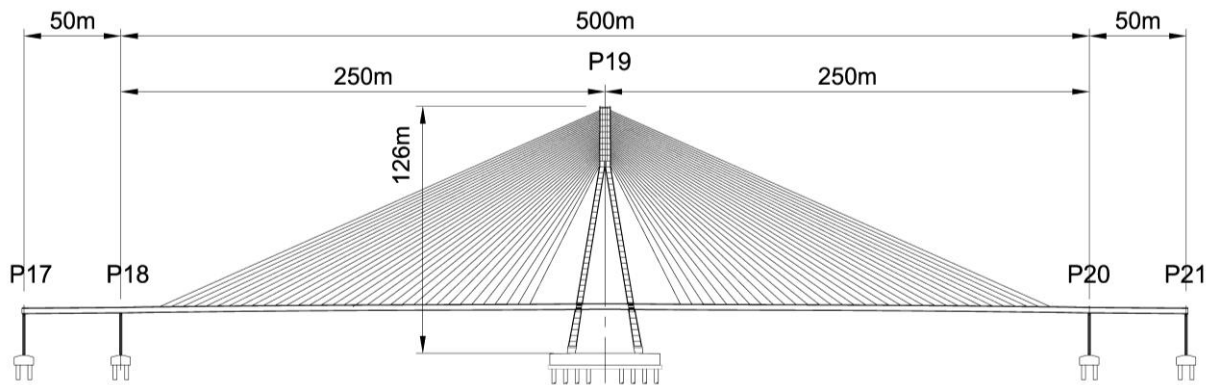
Elevation of Bandra Cable Stayed Bridge at P19
